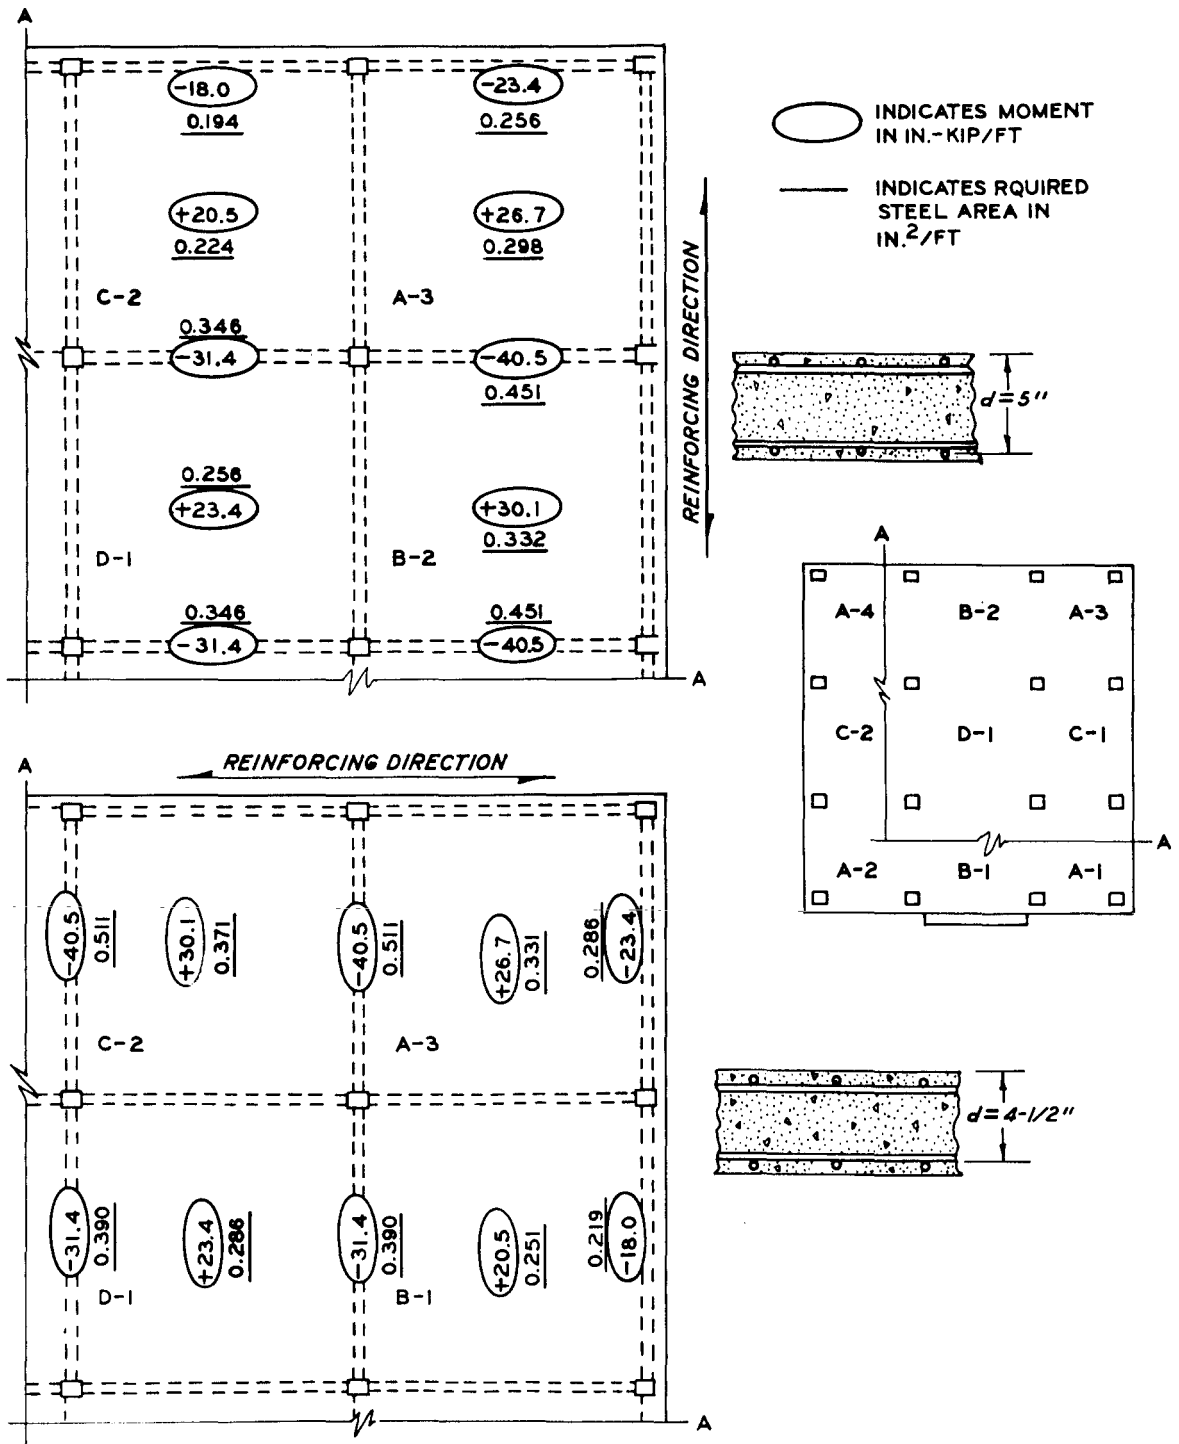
Design moments and reinforcing steel areas for prototype floor slabs.
